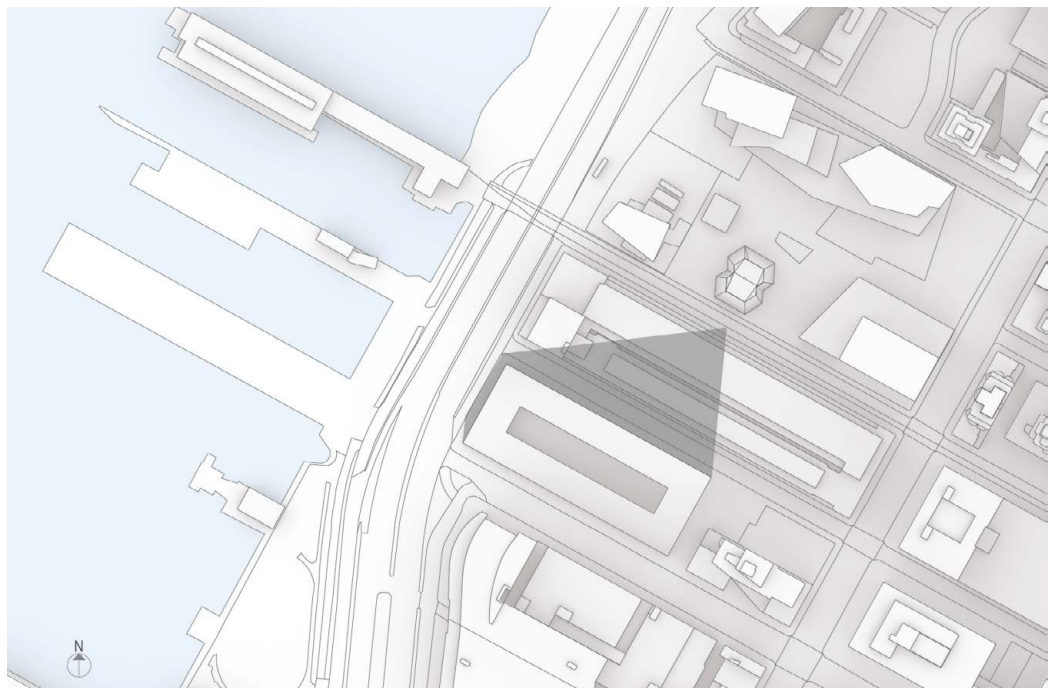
VIA 57West (New York): general plan of the area with only the shadow cast by the building highlighted. Elaboration by the author.
